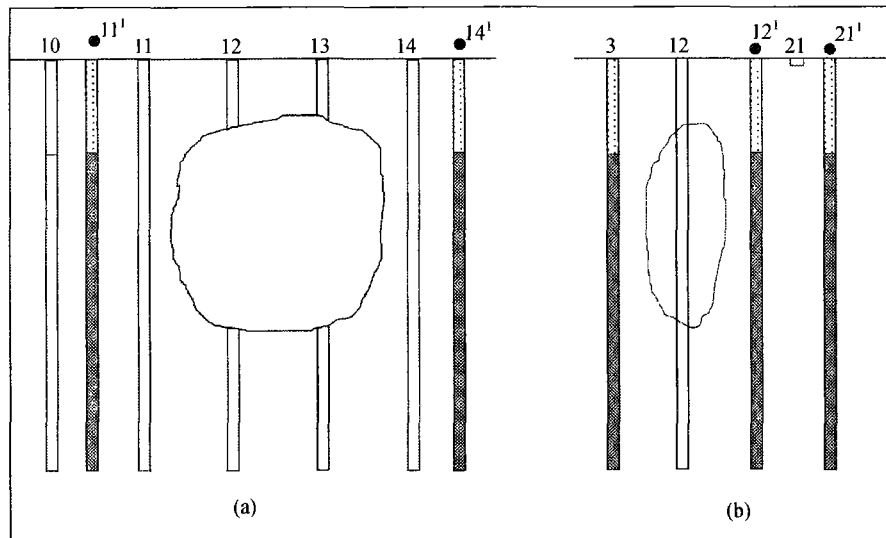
(a) cross and (b) longitudinal section of blast pattern.
